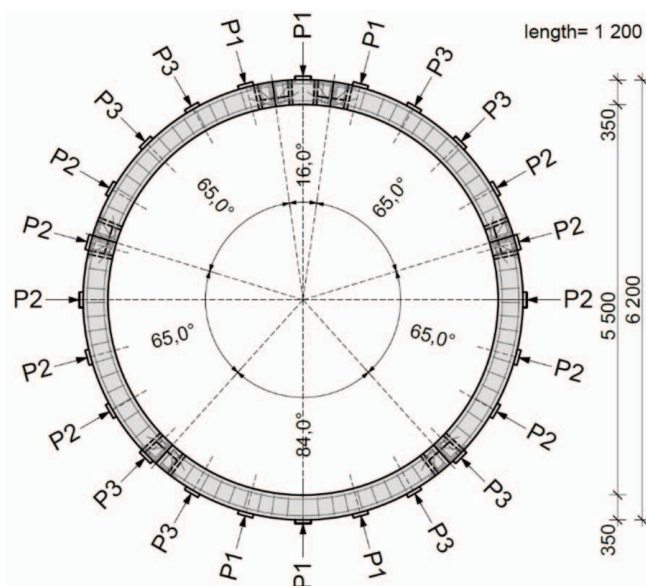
Geometry, reinforcement and loading configuration of the tunnel.
